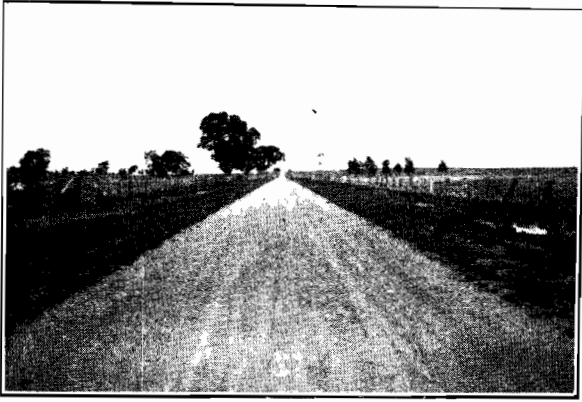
Showing completed work on the Benalla-Yarrowonga Road.
